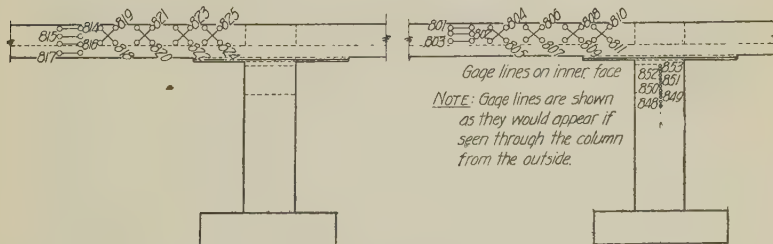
LOCATION OF GAGE LINES ON COLUMN Z AND MARGINAL BEAMS OF SLAB S.
